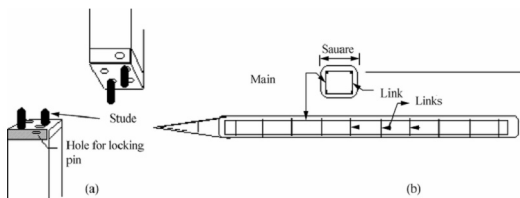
(a) concrete pile connecting detail. (b) squared pre-cast concrete pile
